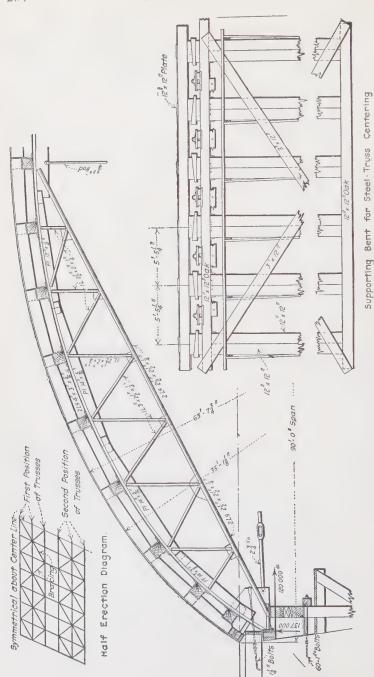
Steel centering for Atherton Avenue bridge, Pittsburgh, Pa.
